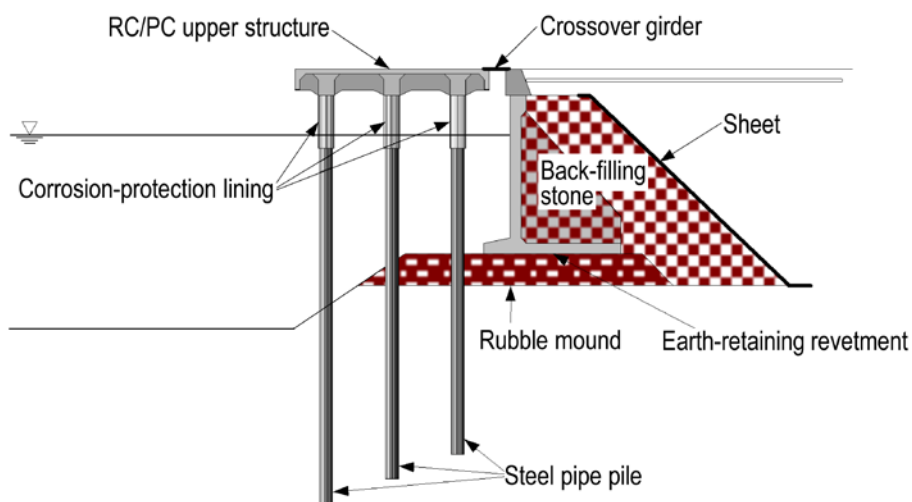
Typical Structure of Steel Pipe Pile-type Mooring Quay
